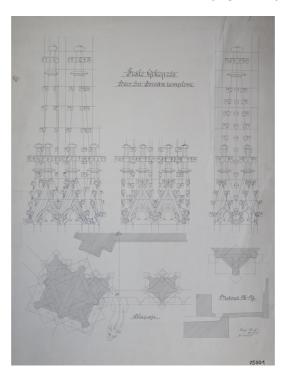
Spire detail of the The Church of St. Stephen, Vienna. Drawing of Károly Csányi, III. year student;24. 04. 1895. Source: Plan collection of the Department of History of Architecture No. 102345.
